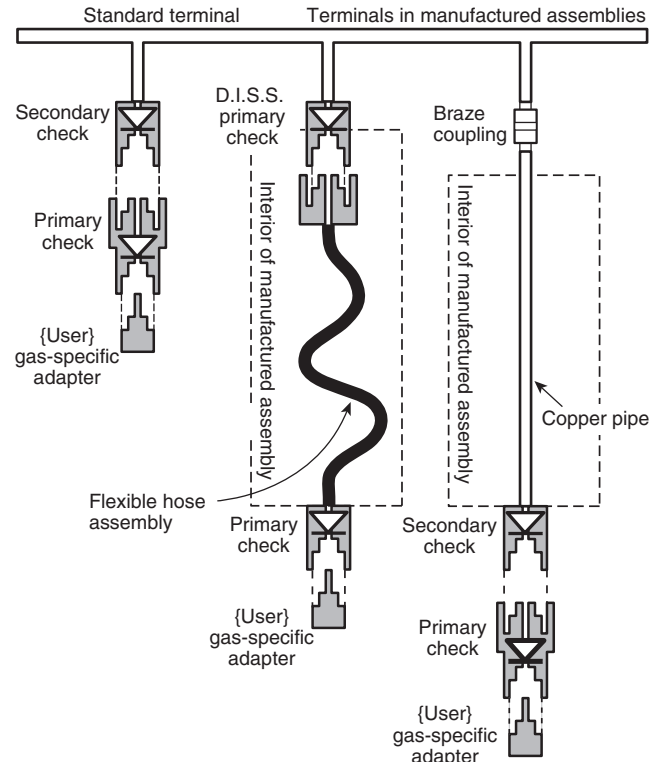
Terminals in Manufactured Assemblies.
